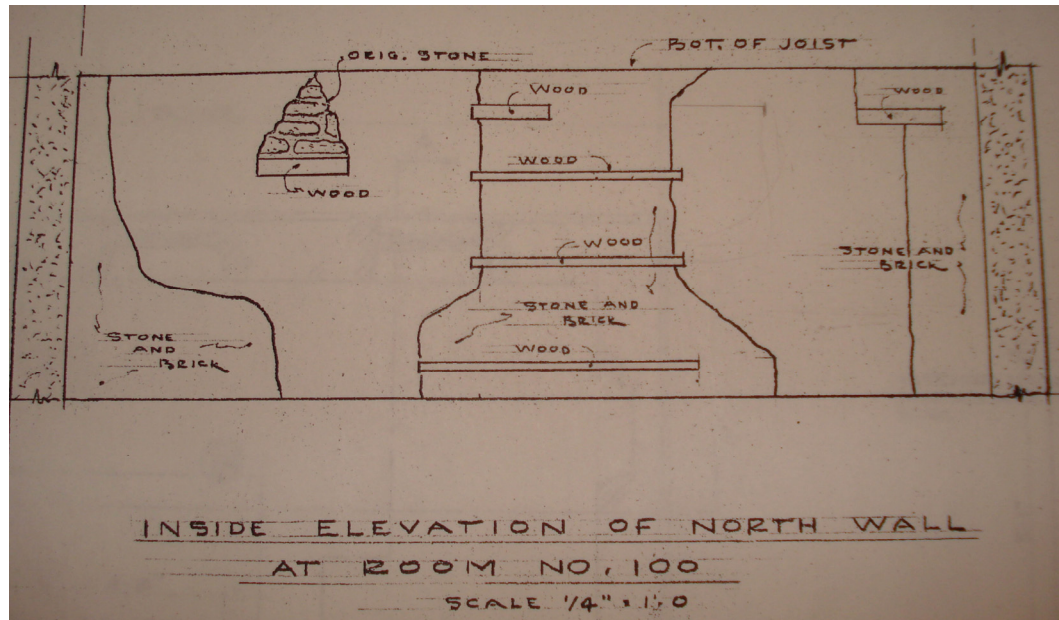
Detail of “Inside Elevation of North Wall...” in Store. 5, 18, 1954. Plan M, 10 of 11. Old Salem Museums & Gardens. Original Plans- Perry, Shaw & Hepburn, Kehoe & Dean, Architects. Boston, Mass.
